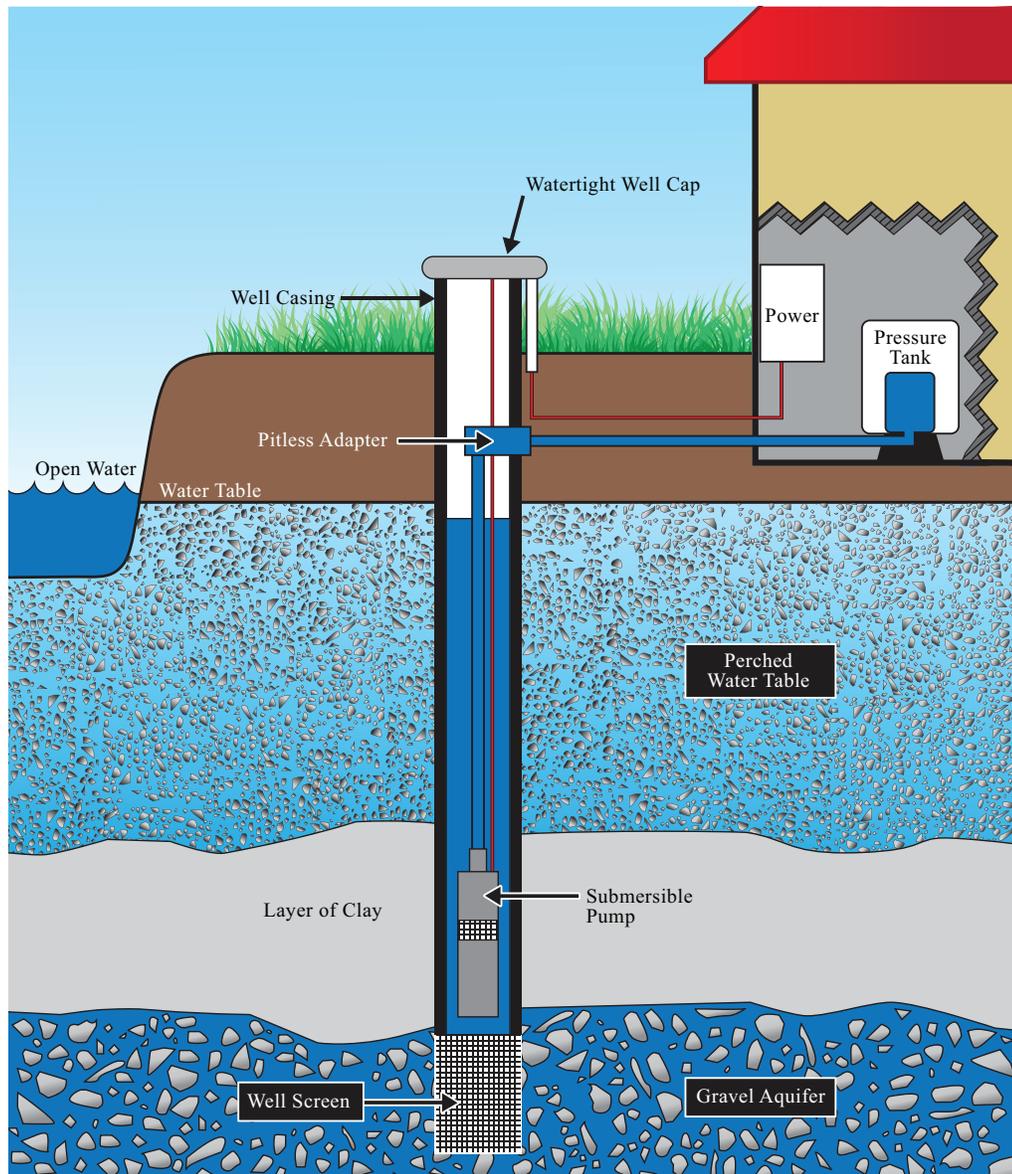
The casing, positioned in the center of the borehole, provides a conduit for water to be drawn out of the aquifer.
